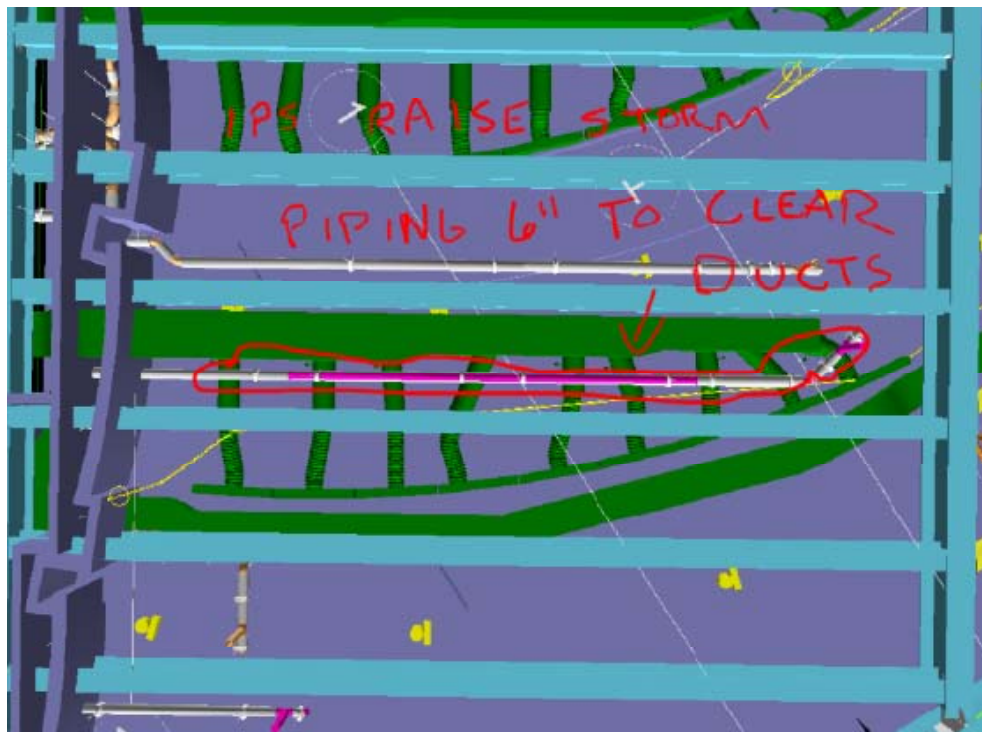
Example 7 – Raise Storm Piping to Clear Ducts
